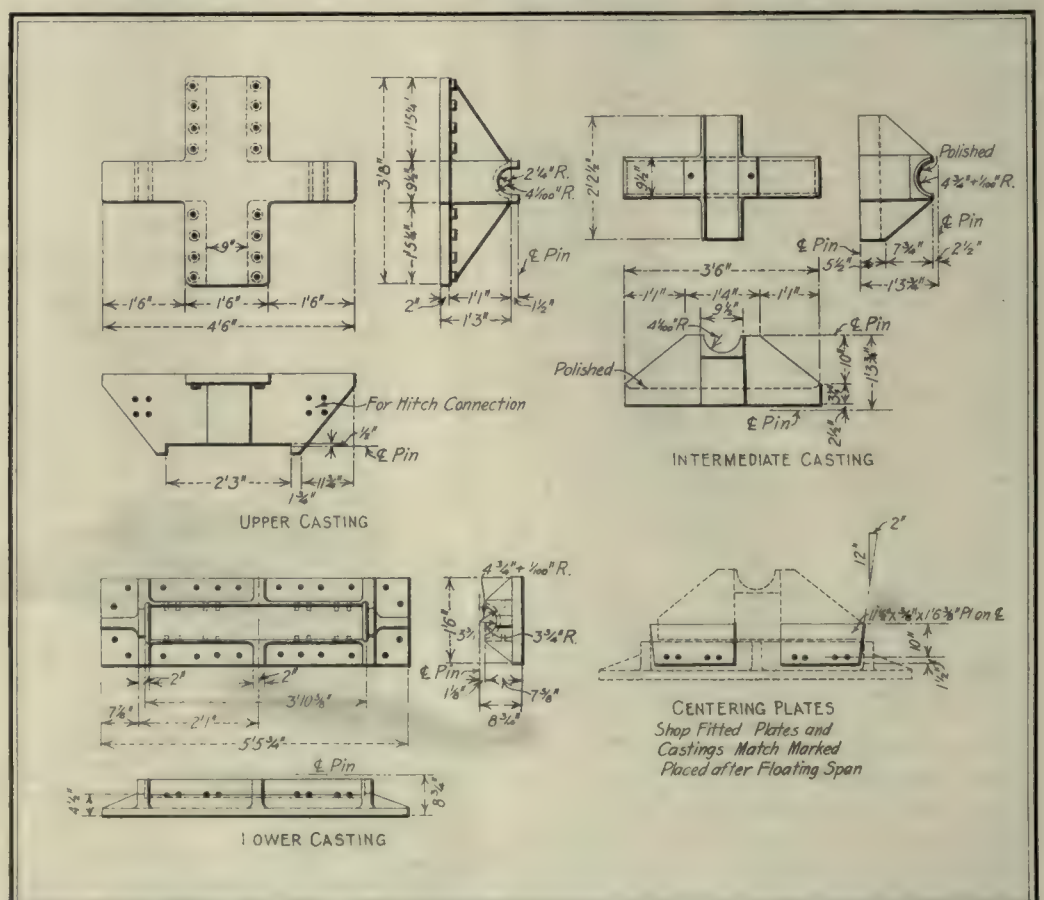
CASTING DETAILS, SHOWING CENTERING PLATES THAT GAVE KEY TO ACCIDENT
